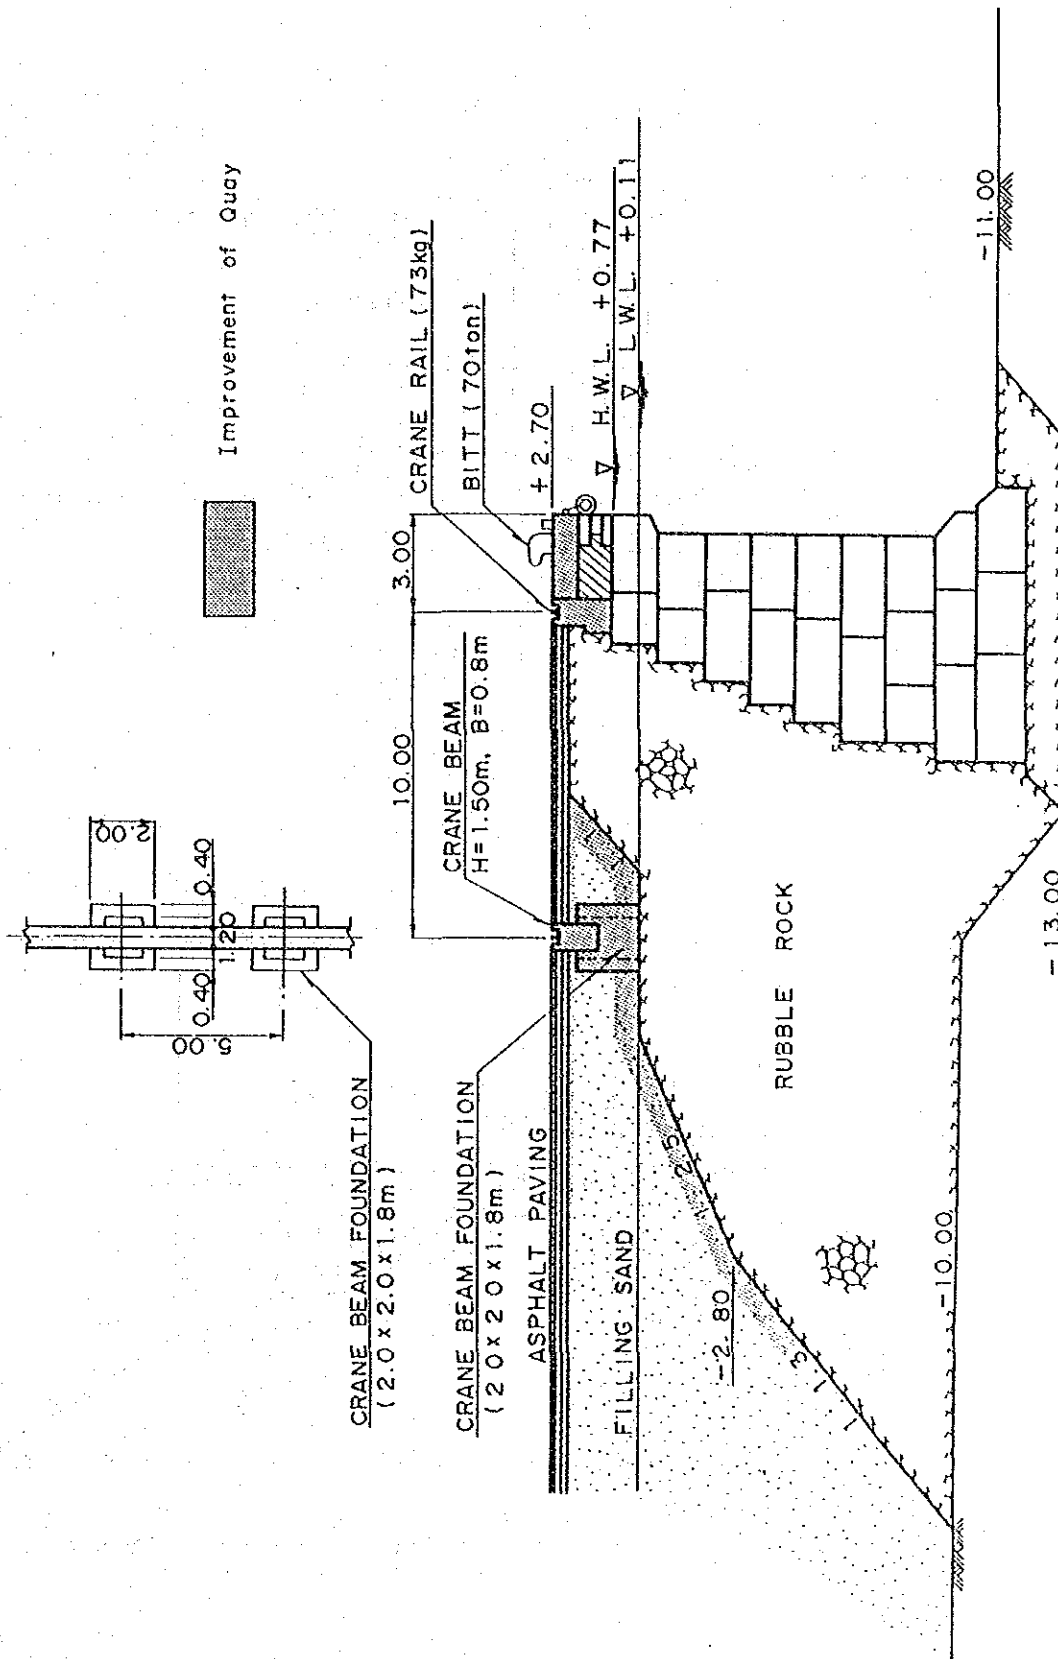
Quay Structure of New North Pier (No. 1 & No. 2 Berth)
